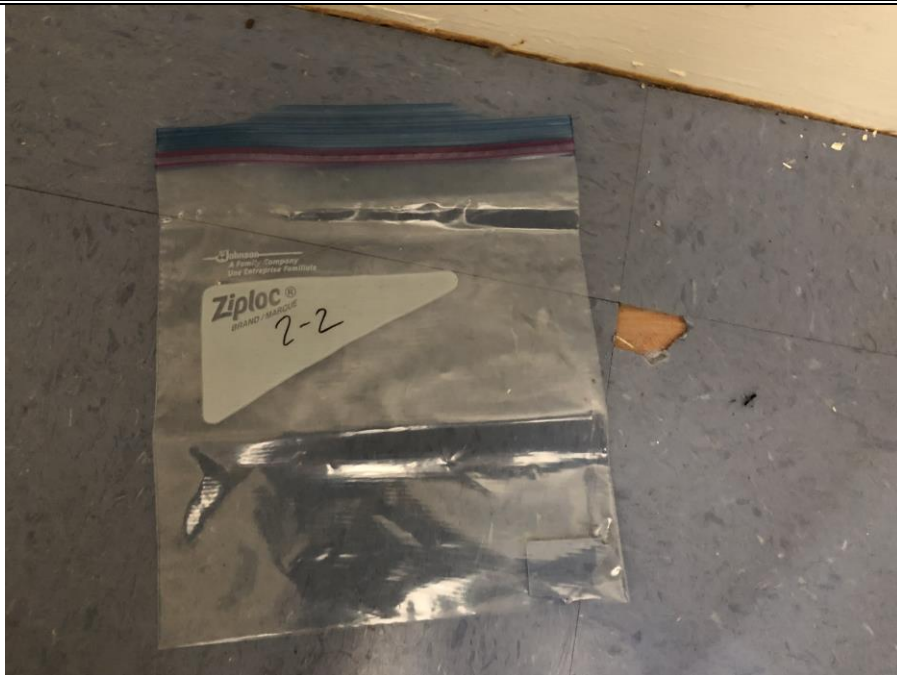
VIEW OF SAMPLED FLOOR TILE AND MASTIC.
